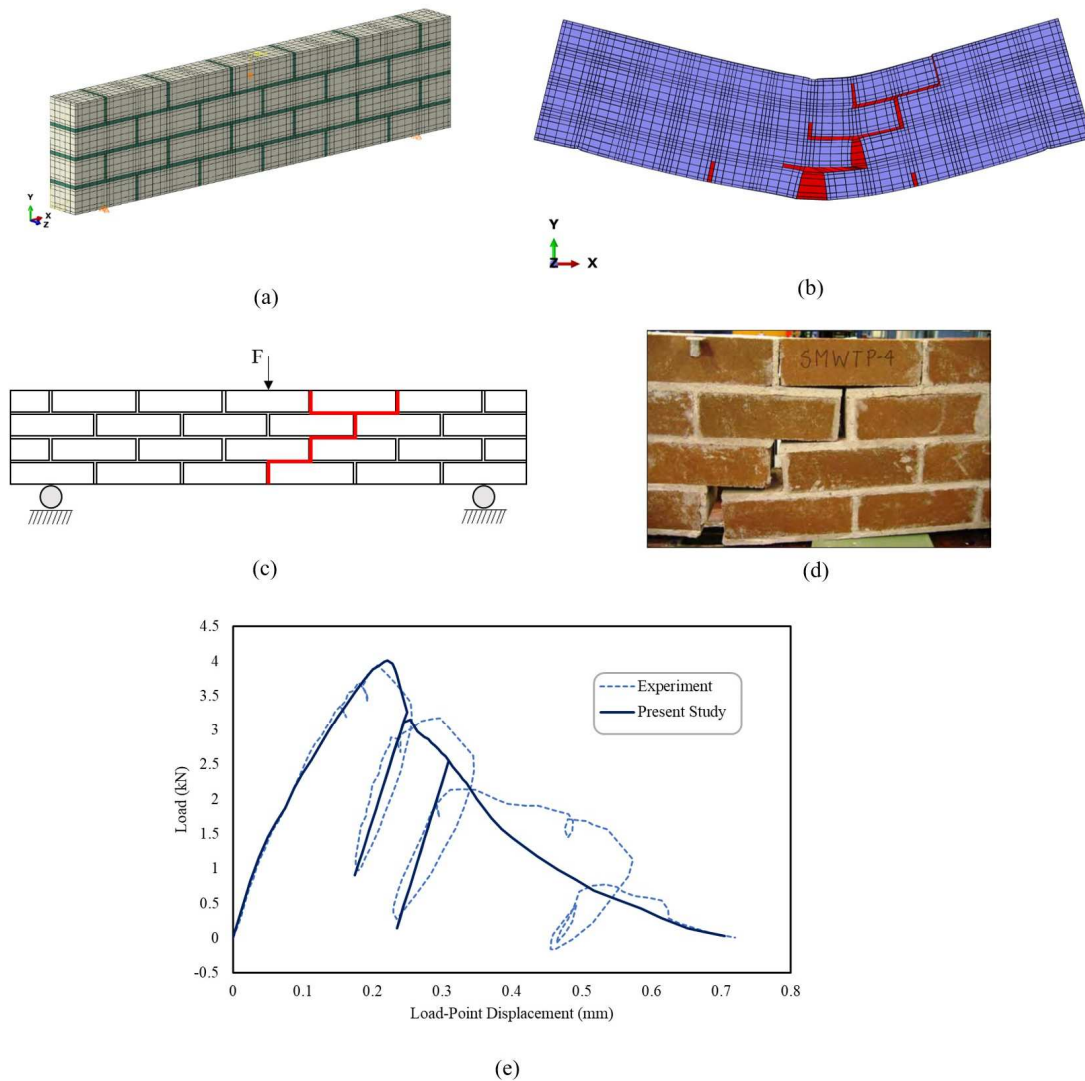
(a) Finite element model of the three-point bending test on masonry beam; (b) deformed mesh showing the final crack pattern; (c) schematic illustration of the experimentally observed crack pattern; (d) picture of the damage pattern; (e) load-displacement curve compared with experimental data
